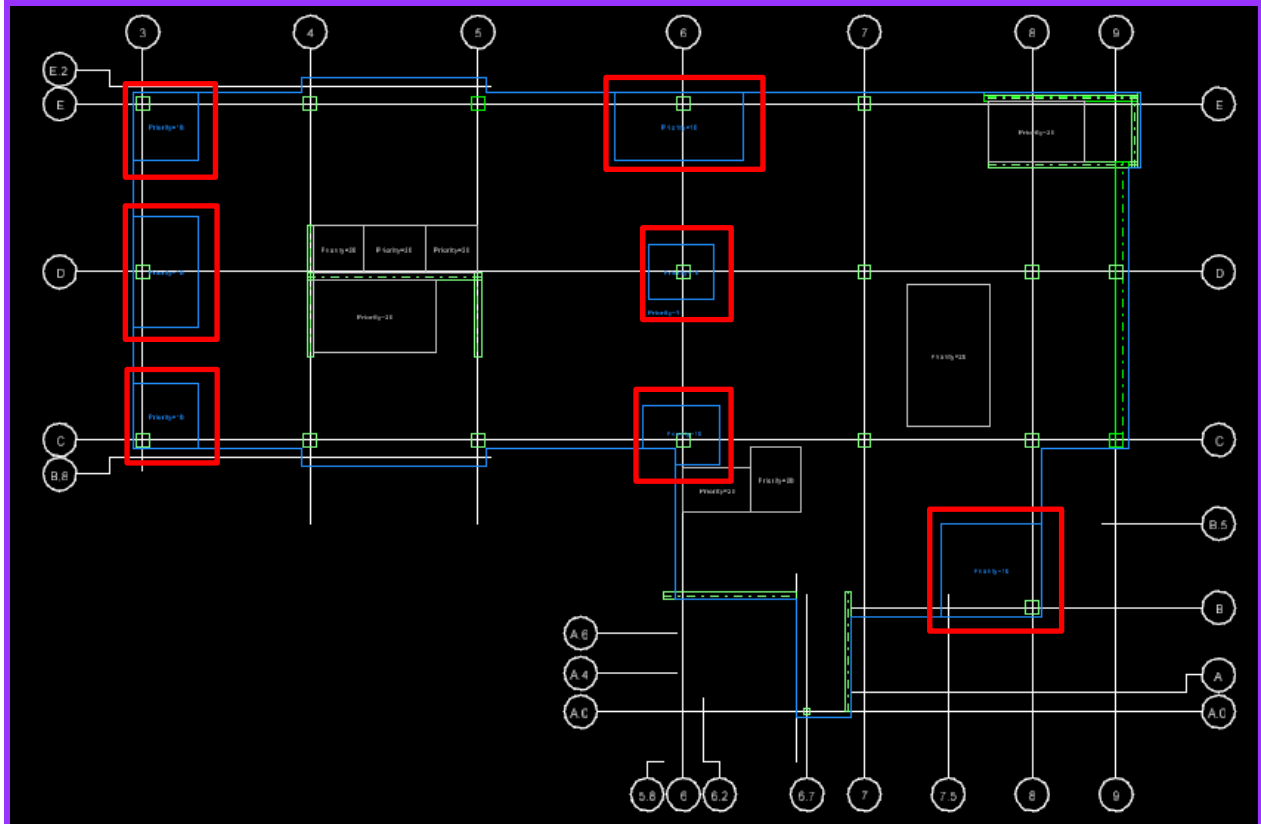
Flat Slab with Drop Panels – RAM Concept Plan
